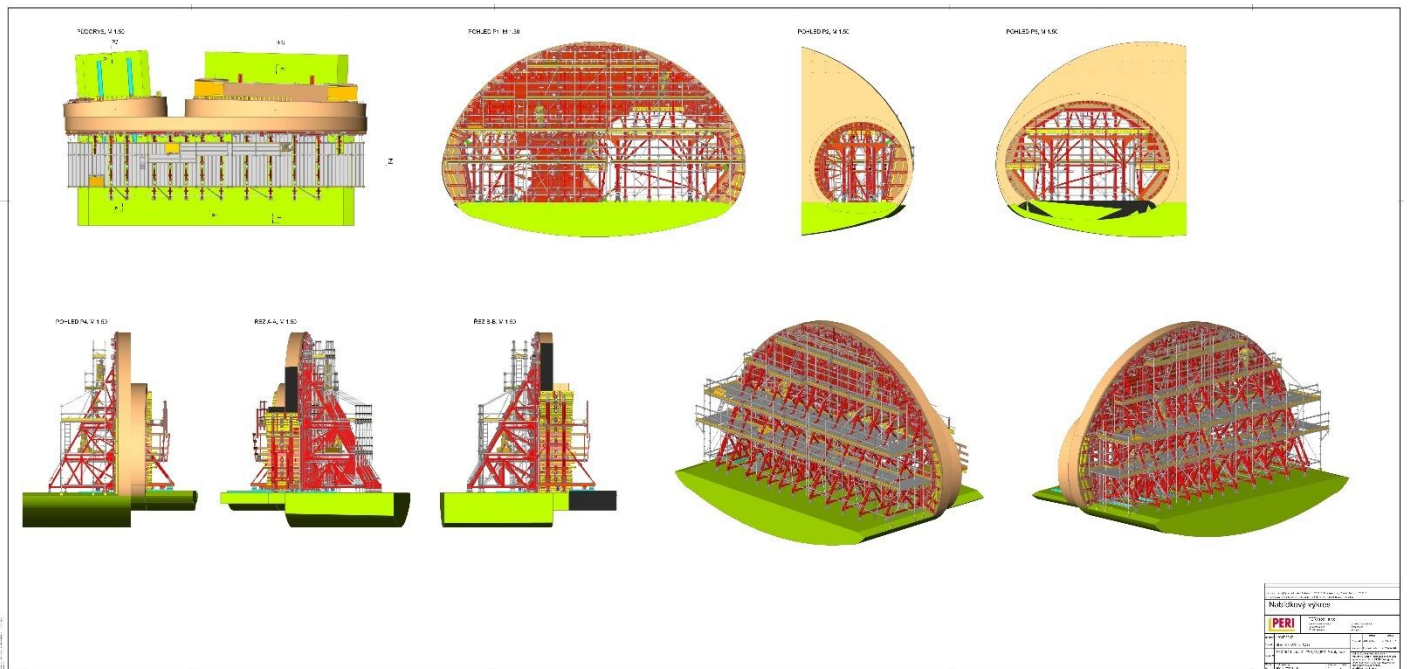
Drawing of formwork for the junction to the lay-by tunnel
